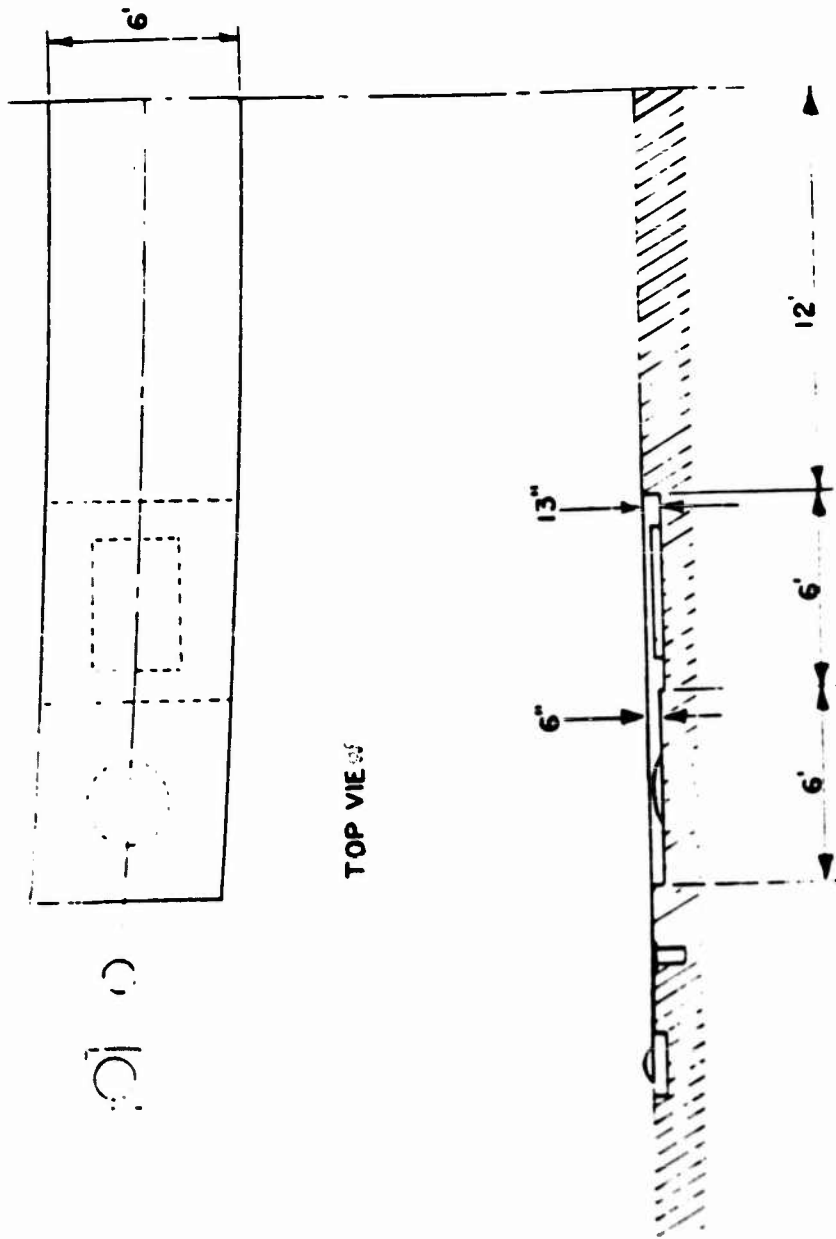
Cross-sectional layout of Project 3.1 stations.
